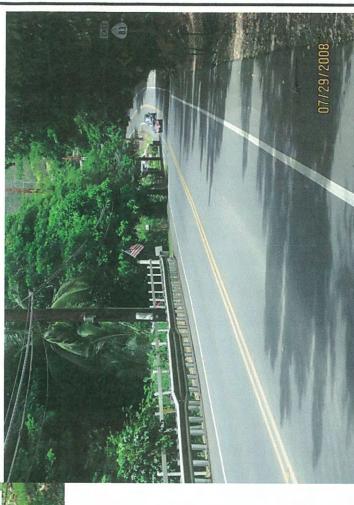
/29/08 from the driveway of Tropical Farms looking towards Kualoa Ranch.
